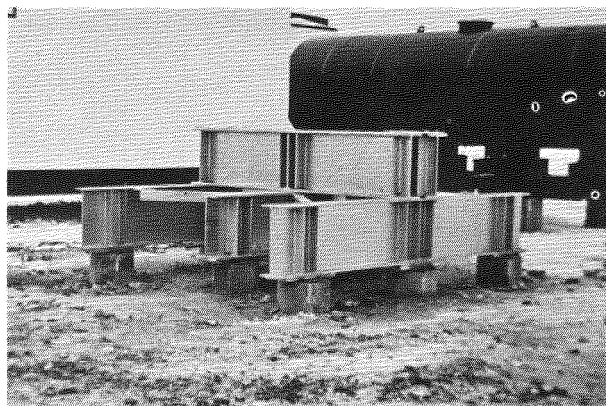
Completed tower foundations with the radio building and fuel tank installed in the background.
